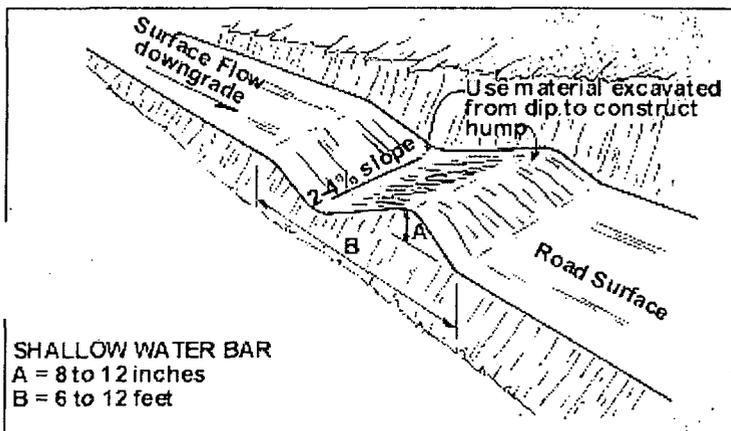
Water bars are narrow structures that may be shallow or deep. Deep water bars are usually used on roads that will be closed for extended periods.
